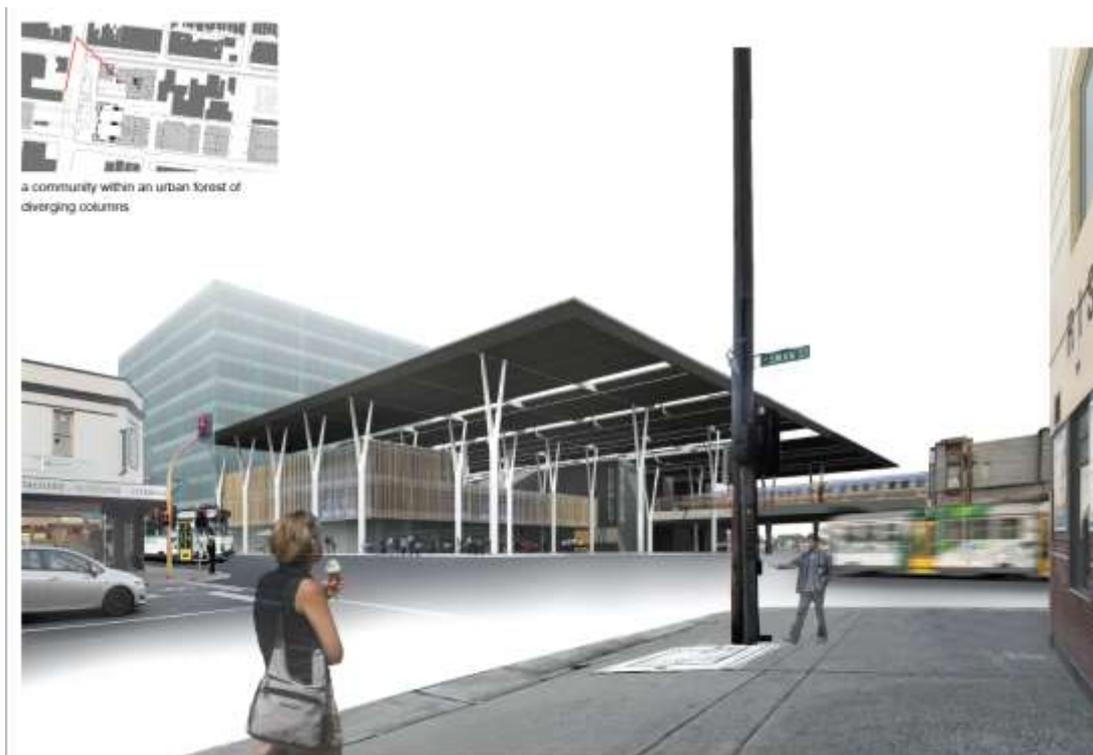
Burnley Station proposal for elevated station. Street view. Image: Farah Yusuf
